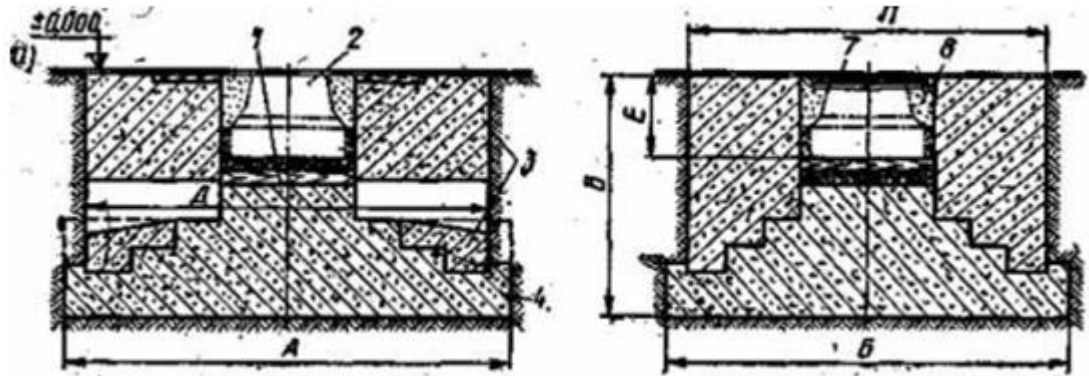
Schemes of the foundations under the steam forging hammers: a – rigid foundation, 1 – gasket under the anvil, 2 – anvil, 3 – concrete
